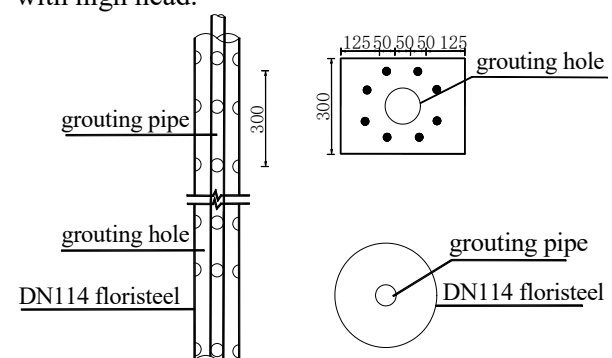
Schematic Arrangement of Flower Steel Pipe Reinforcement Grouting
